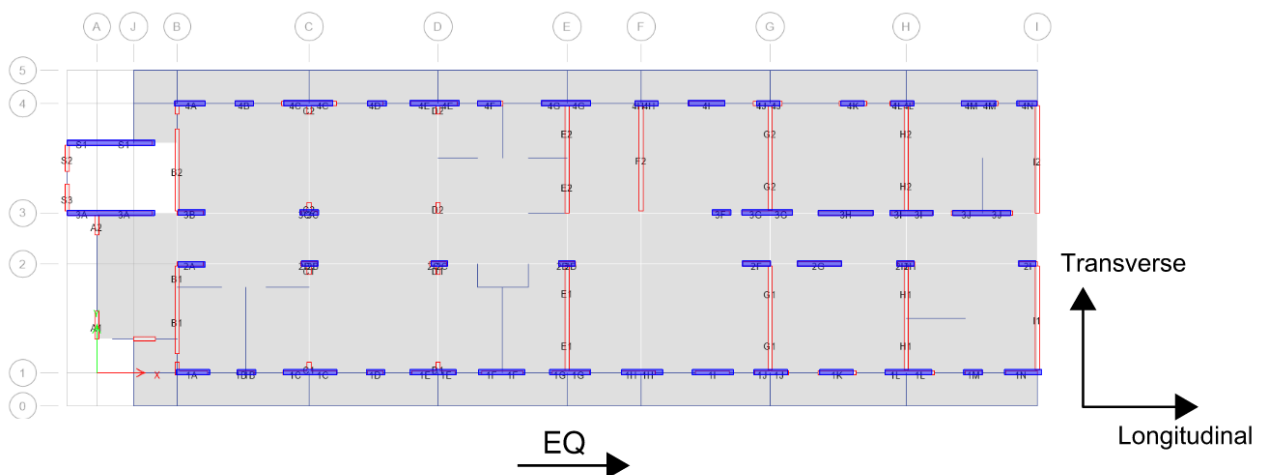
East Wing and West Wing lateral resisting elements in the longitudinal direction
